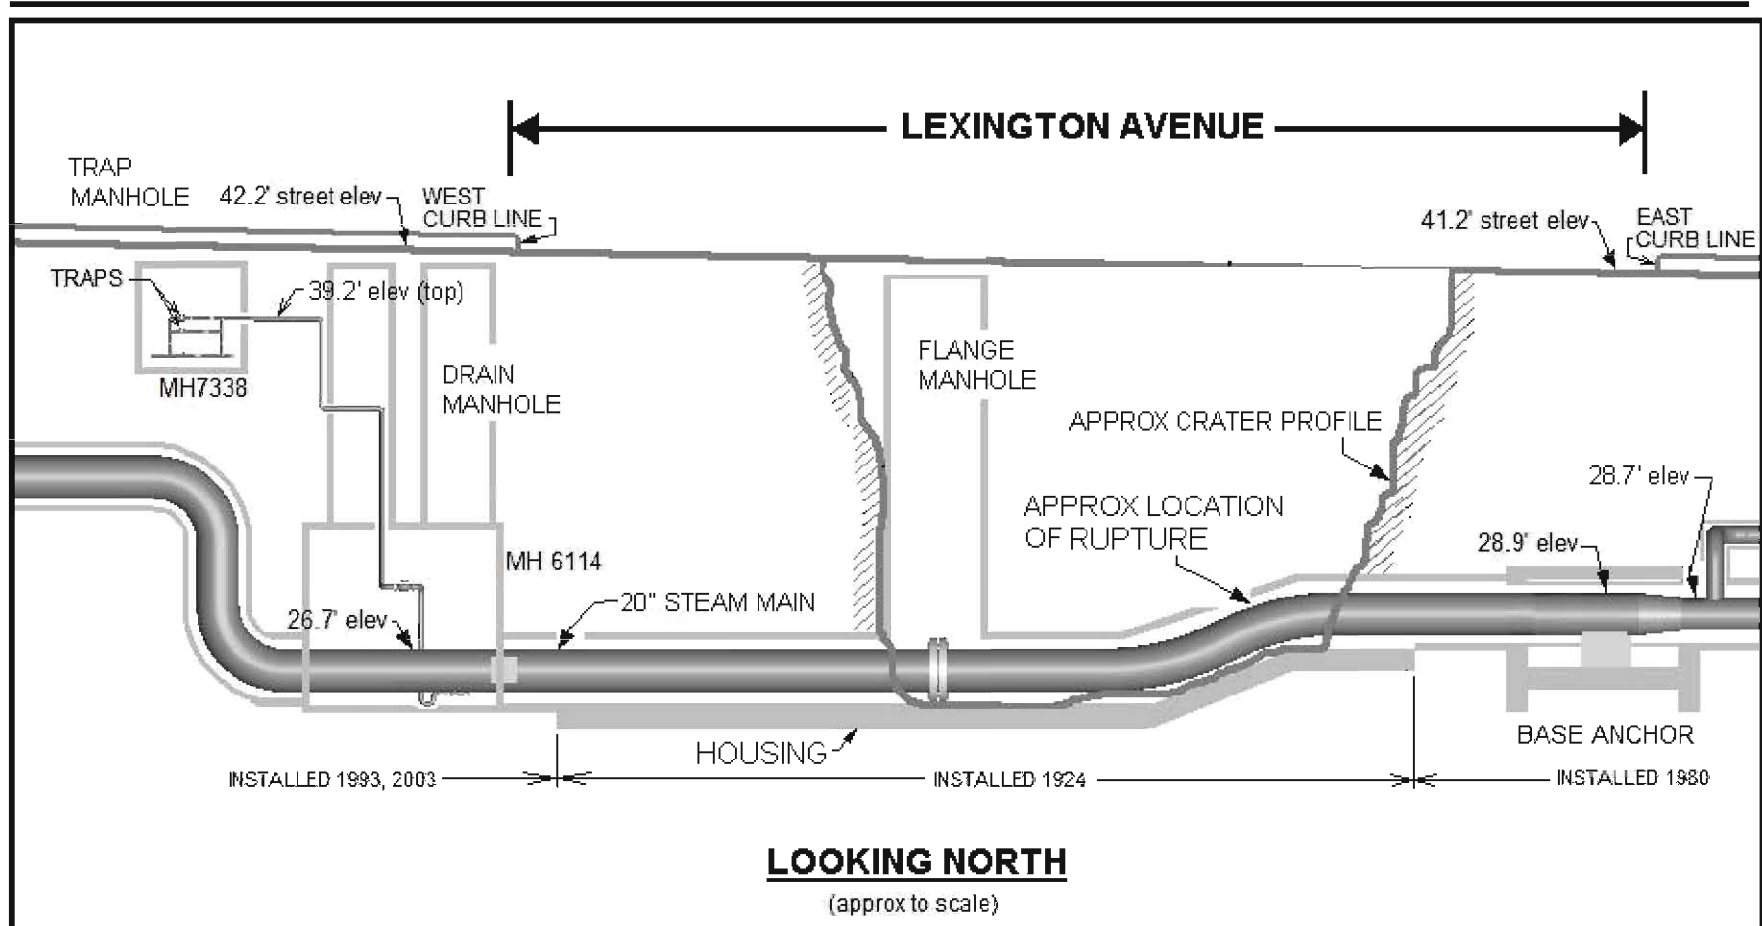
Elevation View of Steam Main Beneath Lexington Avenue
